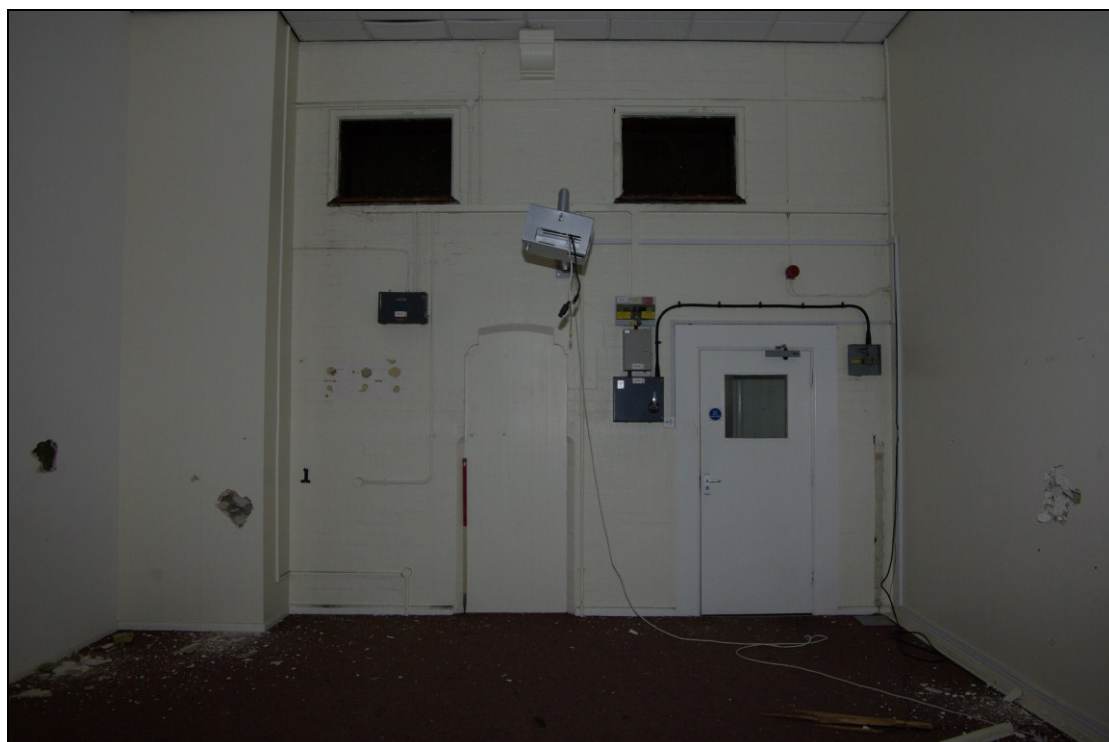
Blocked inserted doorway openings within former boys' schoolroom. Looking north.
